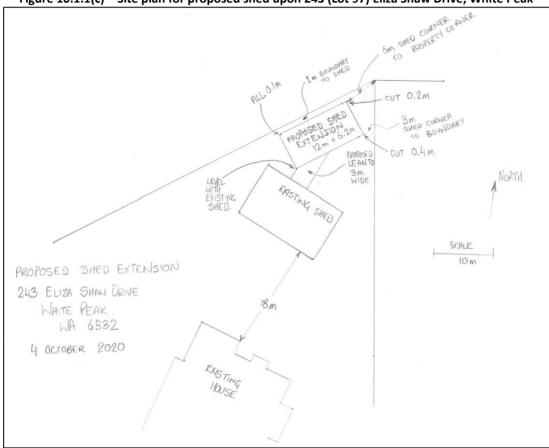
(c) - Site plan for proposed shed upon 243 (Lot 97) Eliza Shaw Drive, White Peak
